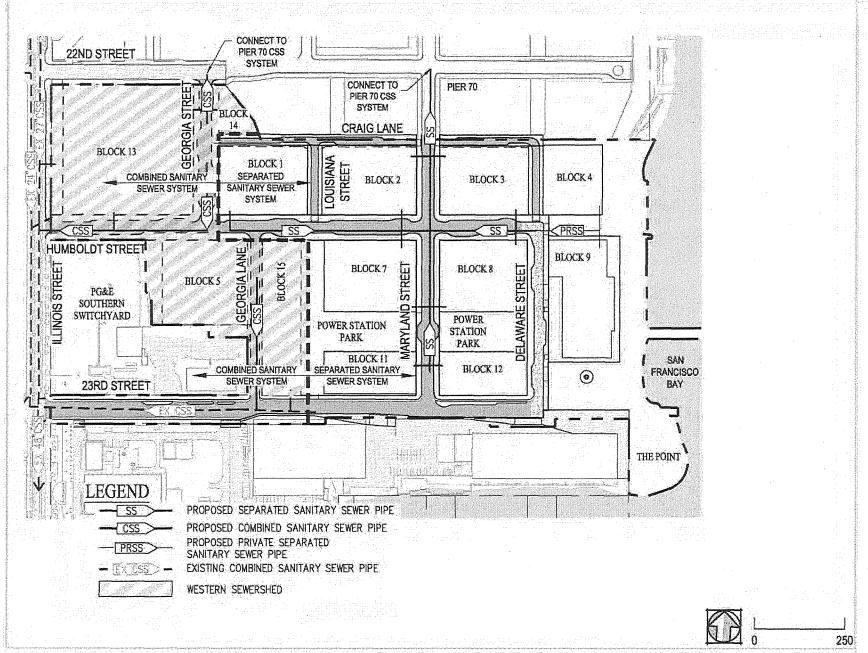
Proposed Separated Sanitary Sewer - Northern Connection Alternative
